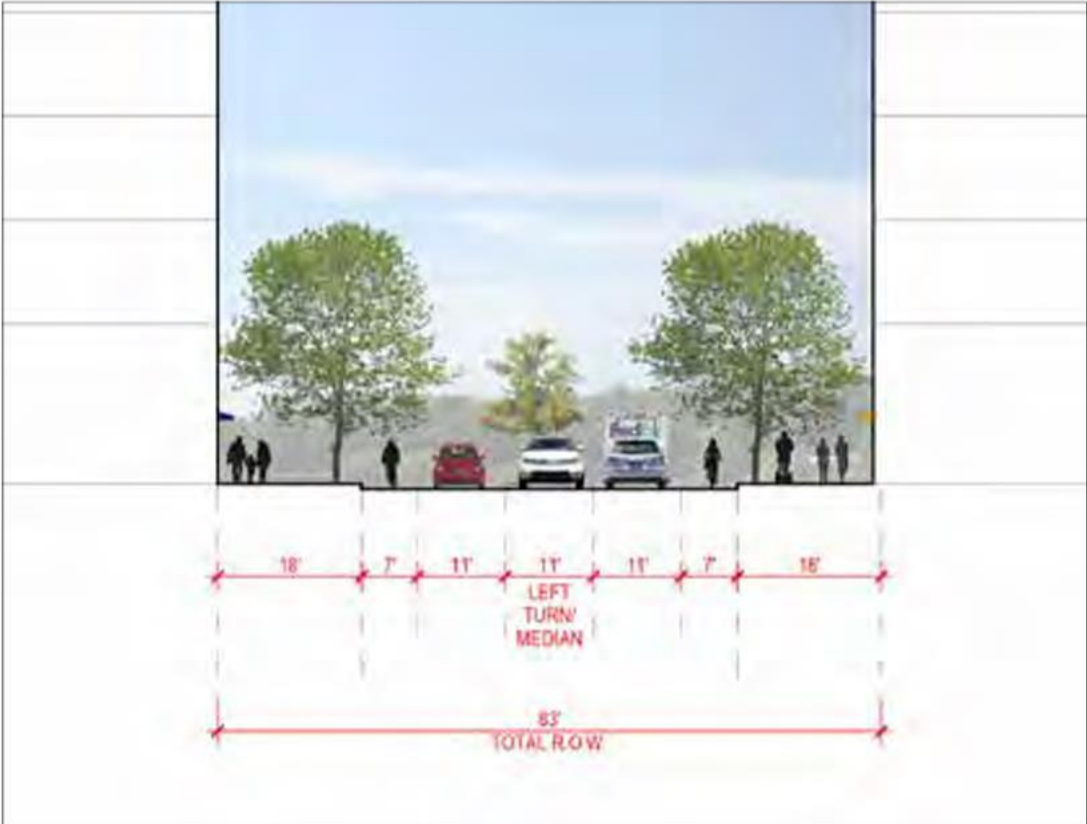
Cross section showing improvements to South Pickett Street - "A" street
